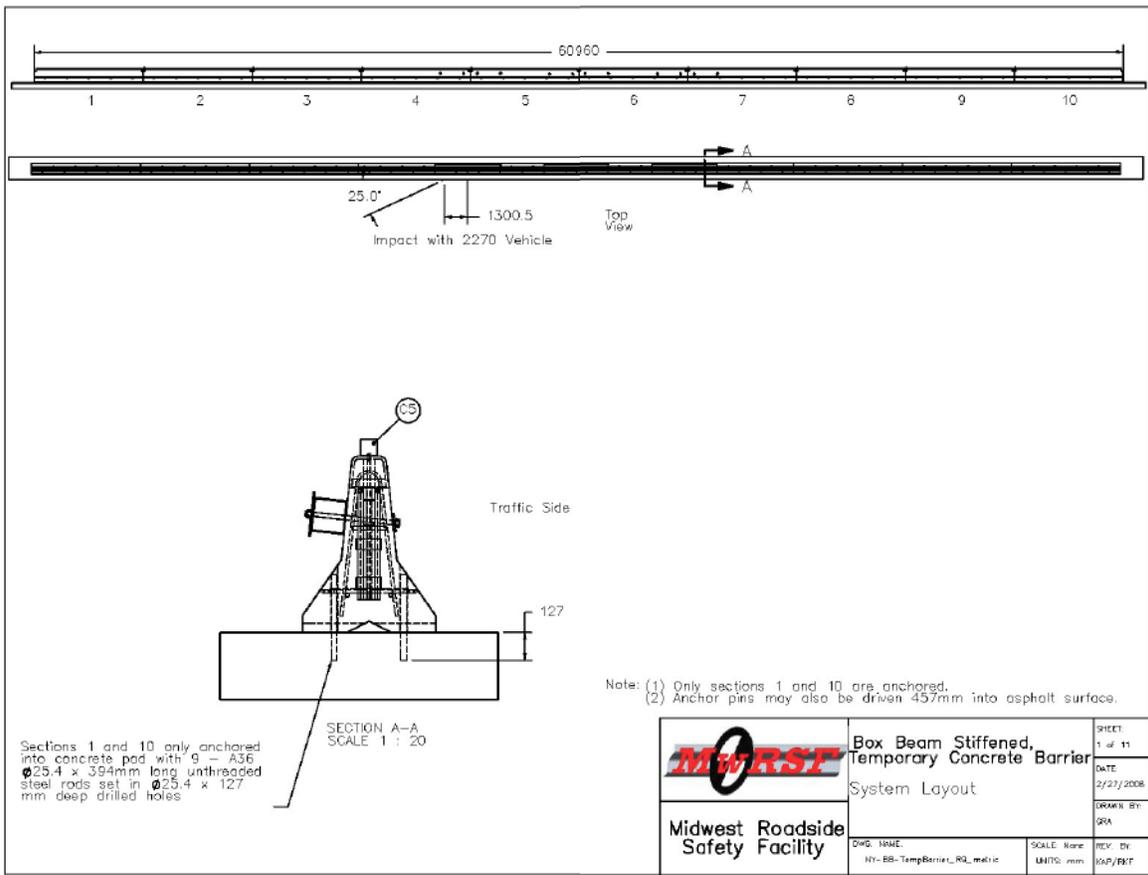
Stiffened Temporary Concrete Barrier System Layout, Test NYTCB-1
